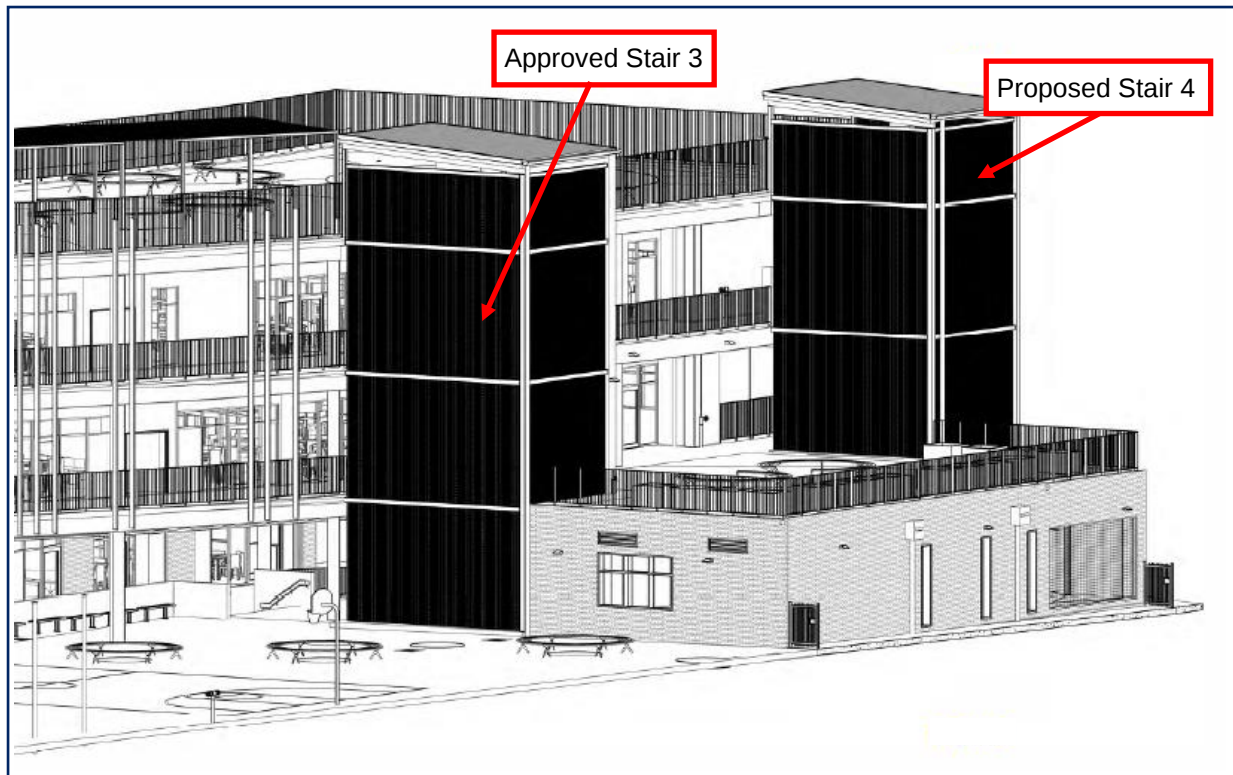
I view looking west to from within the school site (Source: Applicant's modification application 2020)
